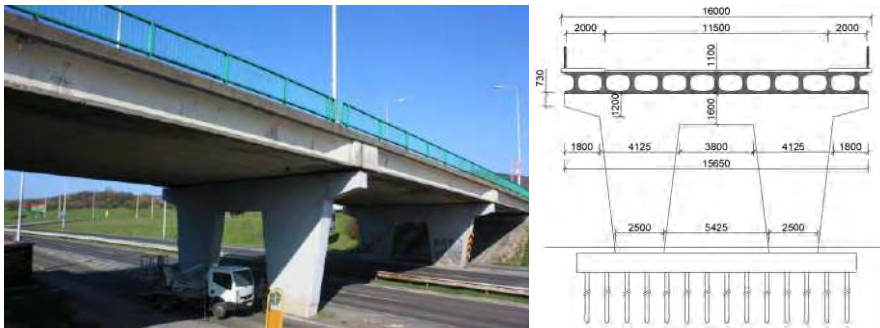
View of the bridge(a), bridge cross-section (taken from the bridge notebook)(b)
